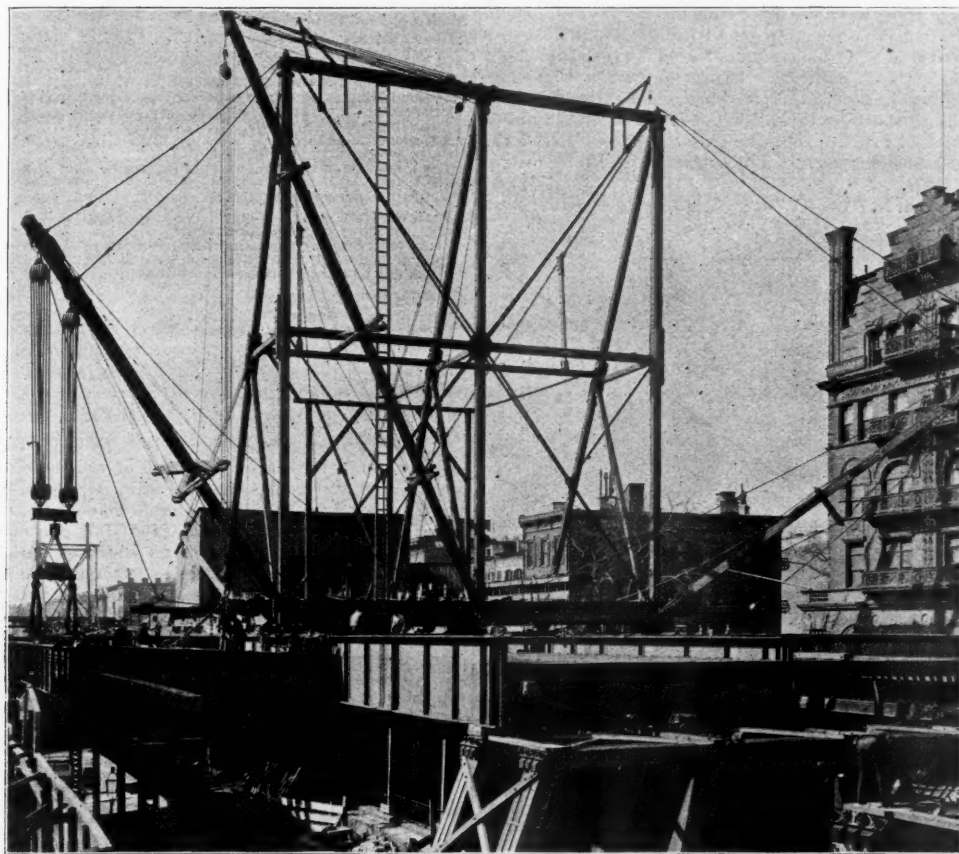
New Jersey Steel and Iron Company's Traveler Near 125th Street, Park Avenue, Looking South.
